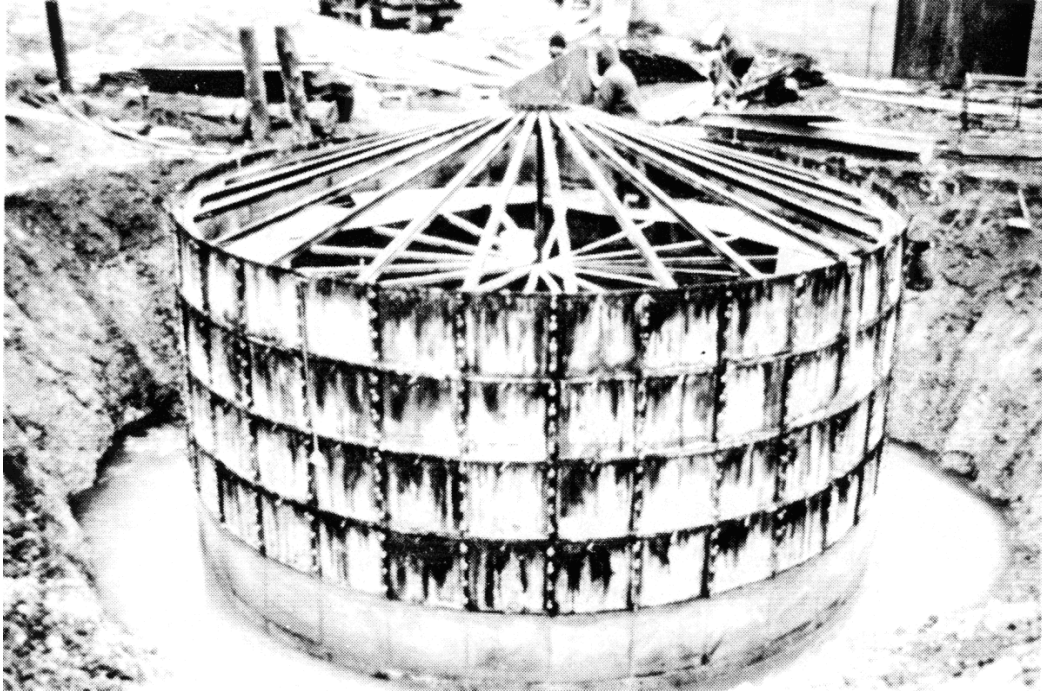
Construction of digester walls showing forms and removable roof form supports.
